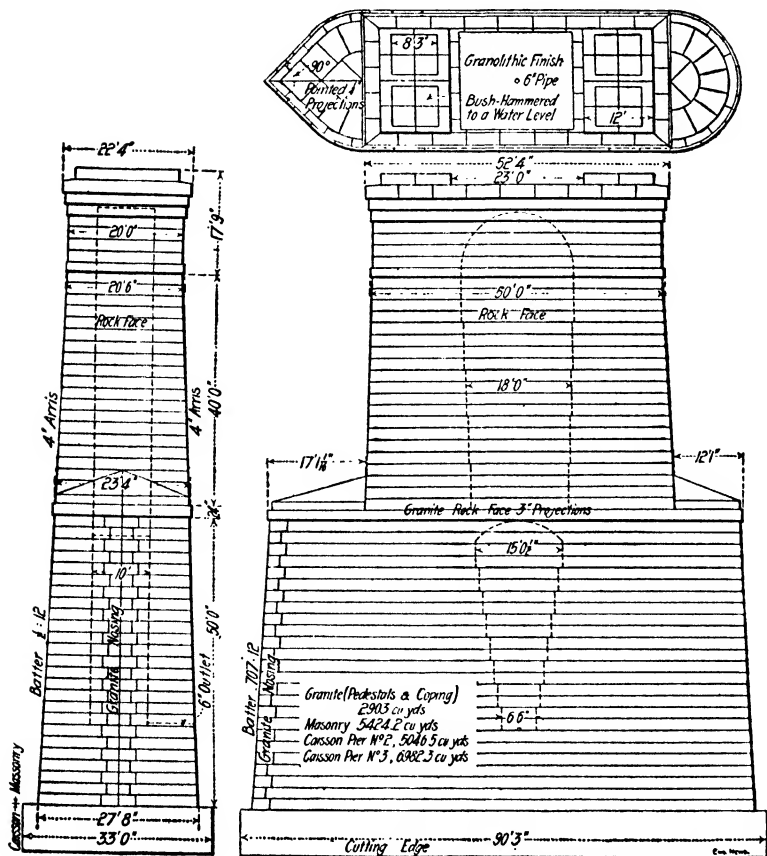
Channel Piers of the Municipal Bridge over the Mississippi River, St. Louis, Mo.
